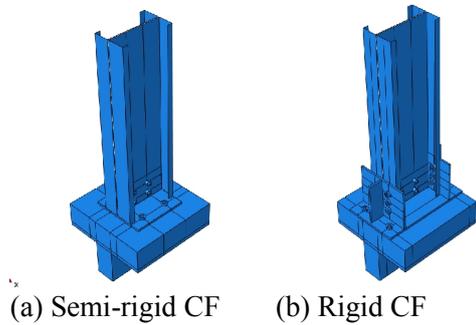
Cold-formed steel column-base connections with chemical anchors
